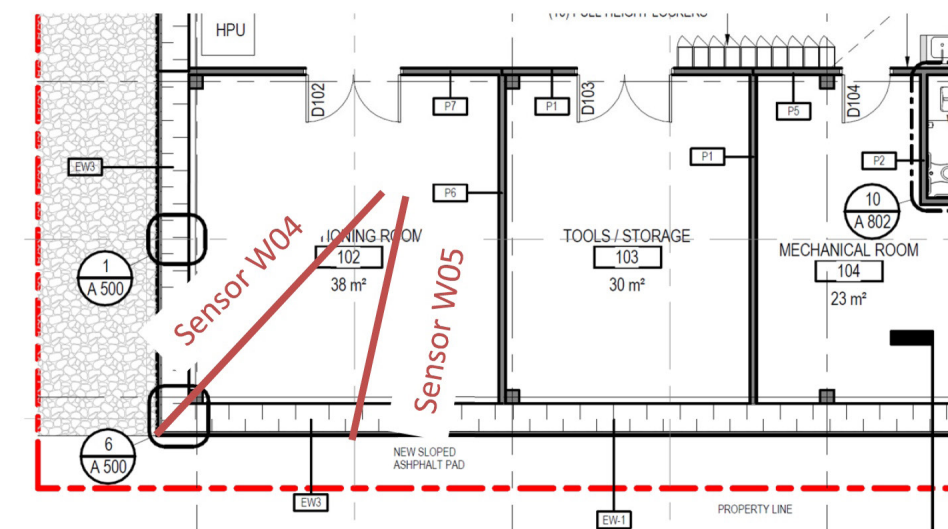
WIRL floor sensor configuration. Sensors are located in a stacked format in two separate parallel lines (labeled as Sensor W04 and W05) located in the southwest corner of the building floor.
